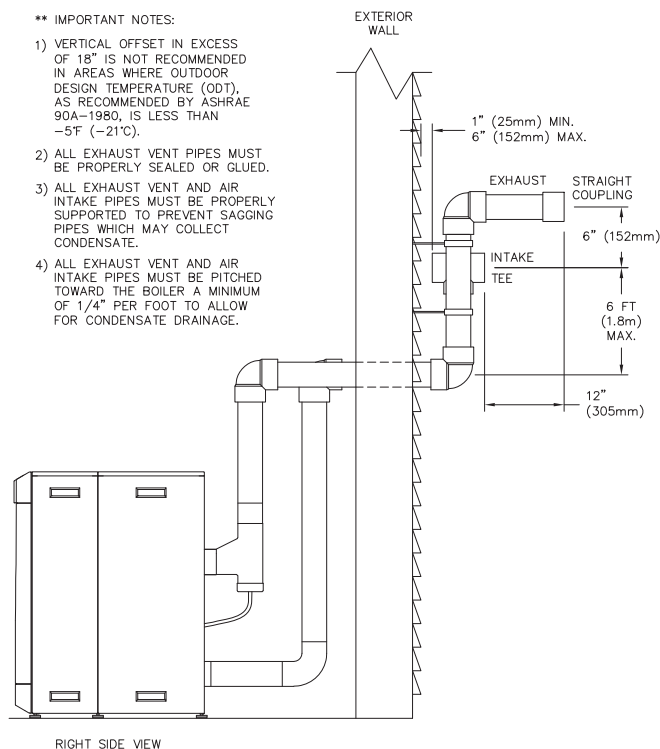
Offset Sidewall Exhaust Vent and Air Inlet Pipe
